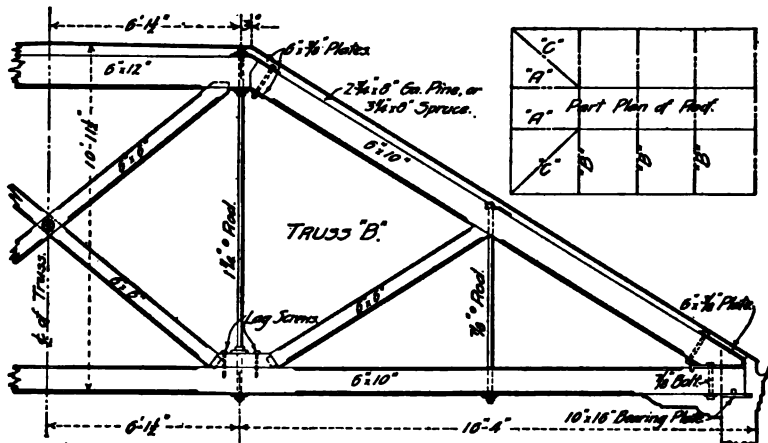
Roof Truss for Mess Hall and Kitchen of War College and Engineer Post, Washington, D.C.
